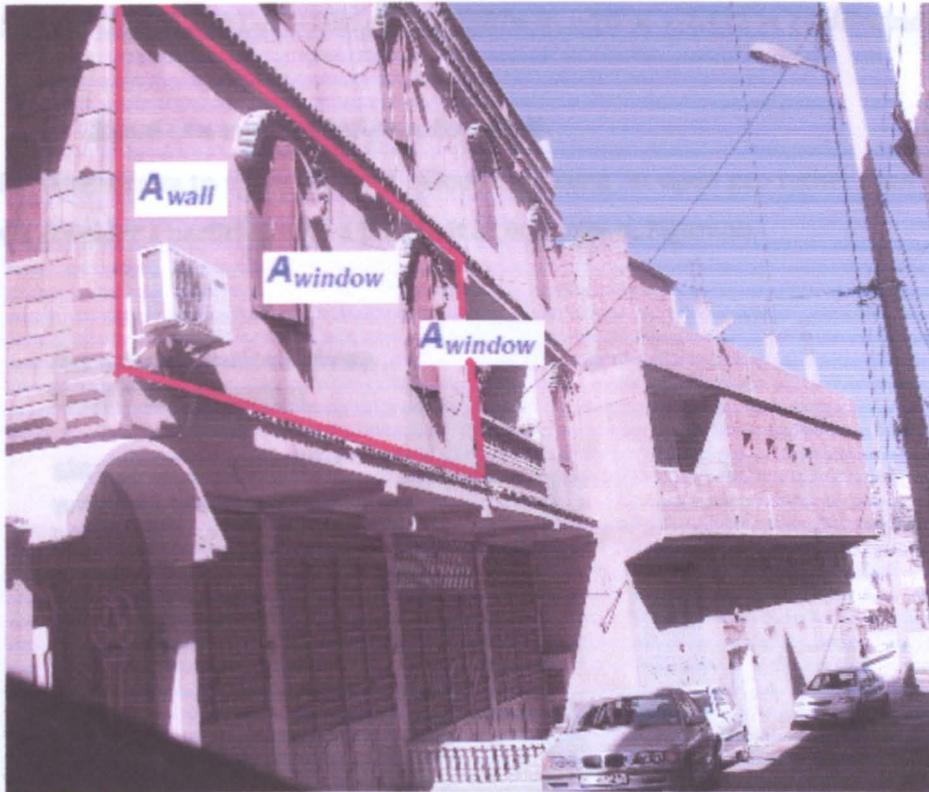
Windows in an external wall of a dwelling close to a wedding hall (Venue 15)
